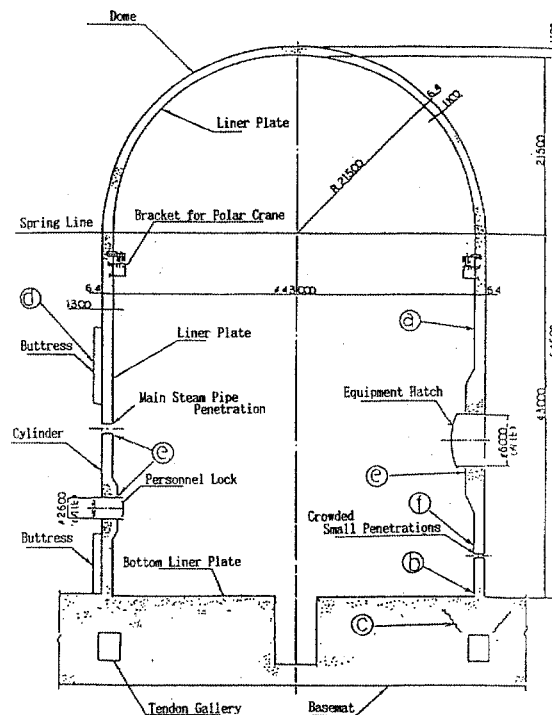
Elevation of PCCV Prototype and Potential Failure Locations
